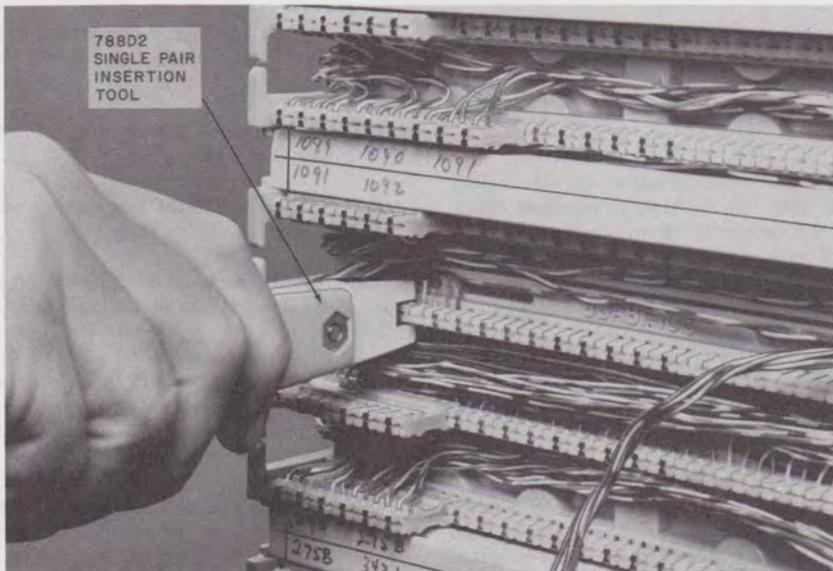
Seating Conductors With Single-Pair Insertion Tool
